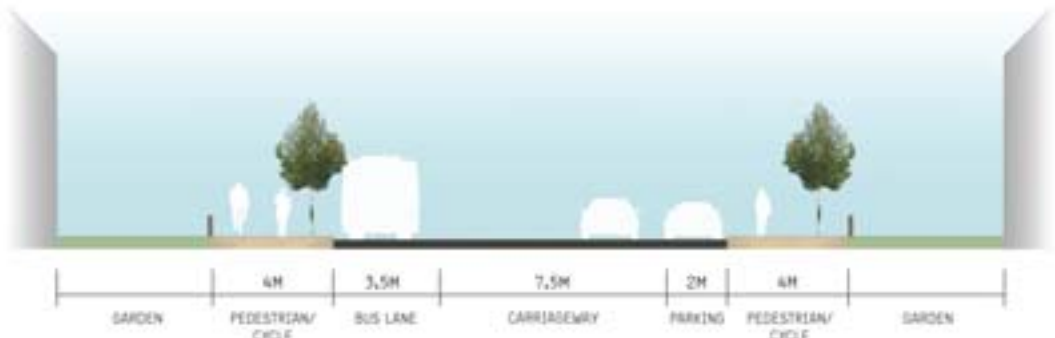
TYPICAL PRIMARY STREET CROSS SECTION - NEW LINK ROAD BETWEEN CUMBERLAND WAY AND TITHEBARN LANE BRIDGE
